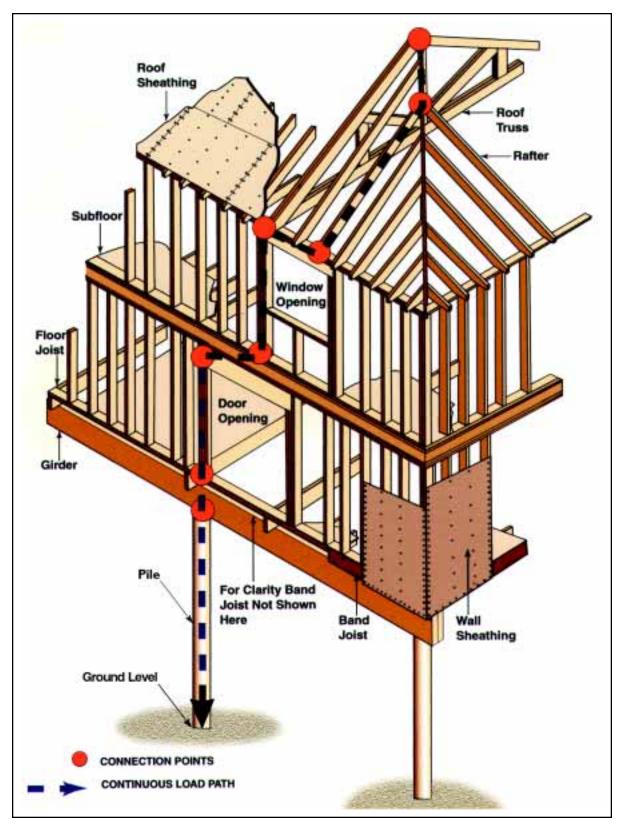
If a building has a continuous load path, forces and loads acting on any portion of the building will be transferred to the foundation of the building. This transfer occurs through building structural members (i.e., columns and beams) and the connections between these members. In this figure, the load path from the roof structure to the foundation is illustrated for an elevated, two-story wood-frame building.
